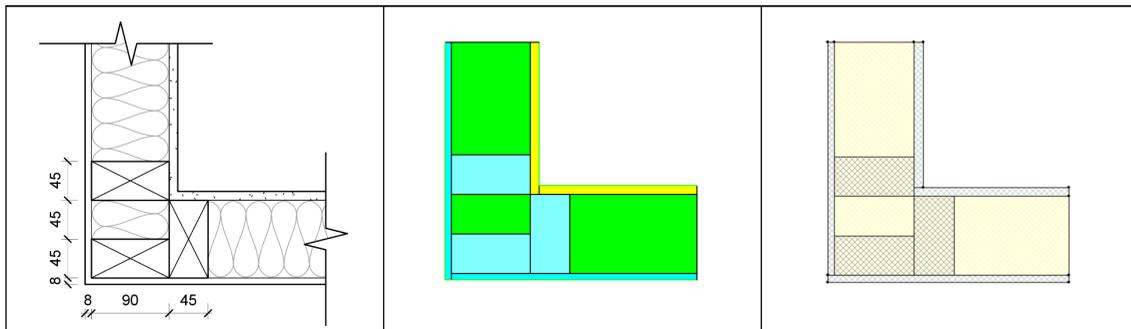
Wall-to-wall thermal bridge detail in (a) Revit drawing, (b) THERM and (c) WUFI 2D. (Source: Authors, 2022)
